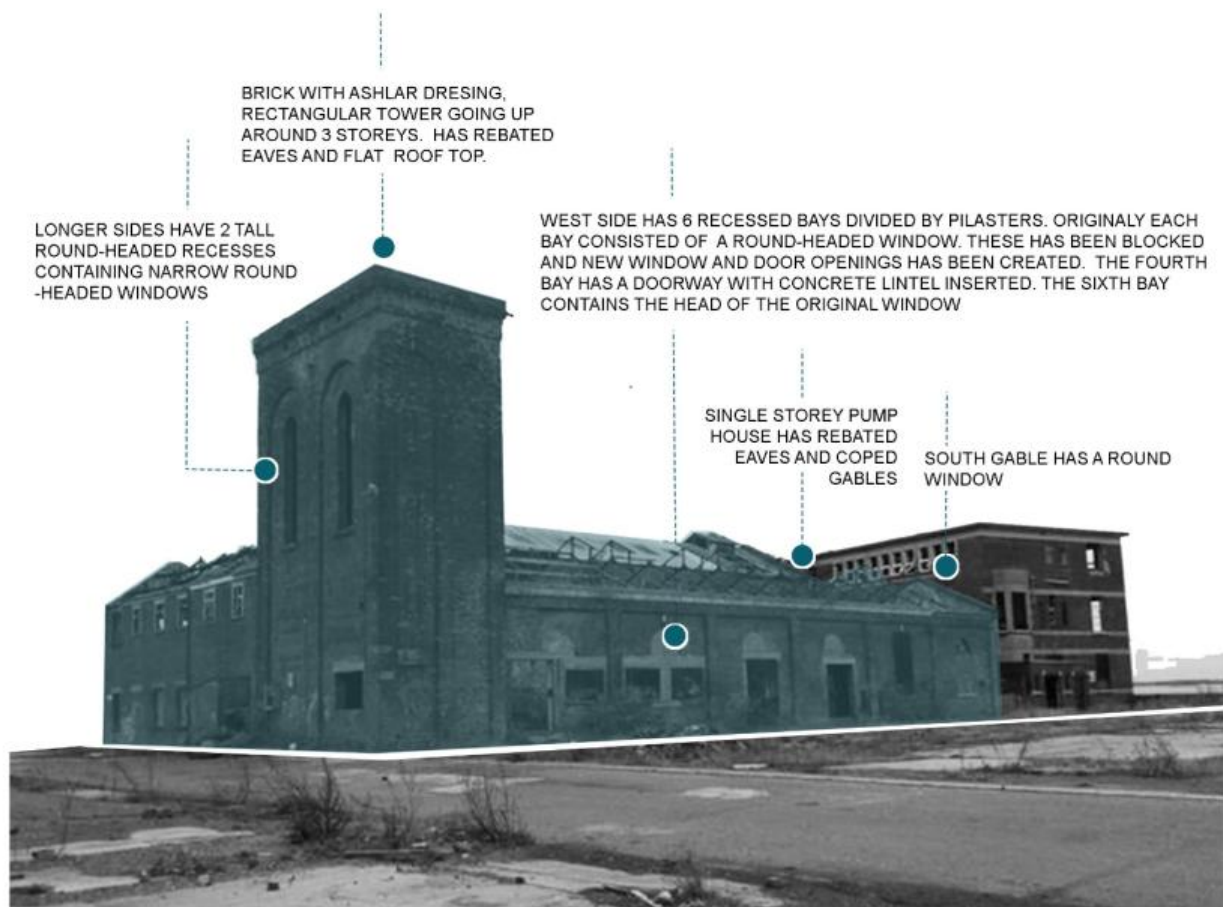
HYDRAULIC TOWER AND PUMP HOUSE DIAGRAM (RABIJ, 2020)
